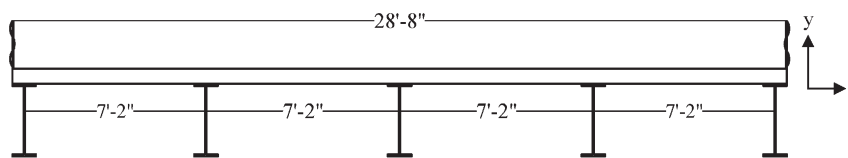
FRP deck-on-steel girder bridge cross-sections of models 9,10,11, and 12
